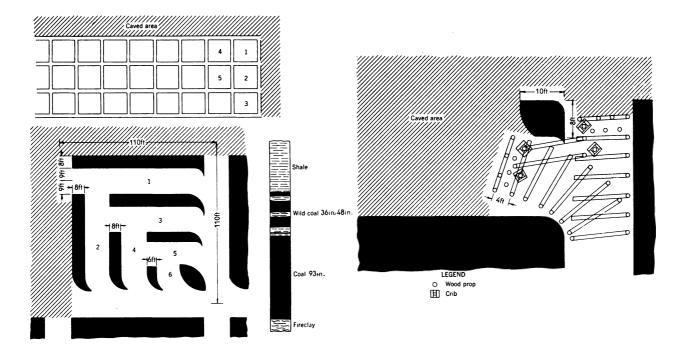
Split-and-fender pillaring with ripper-type continuous miners in the Pittsburgh coal bed using crossbar and post timbering and double cribs during final stump removal.⁽⁴⁾
